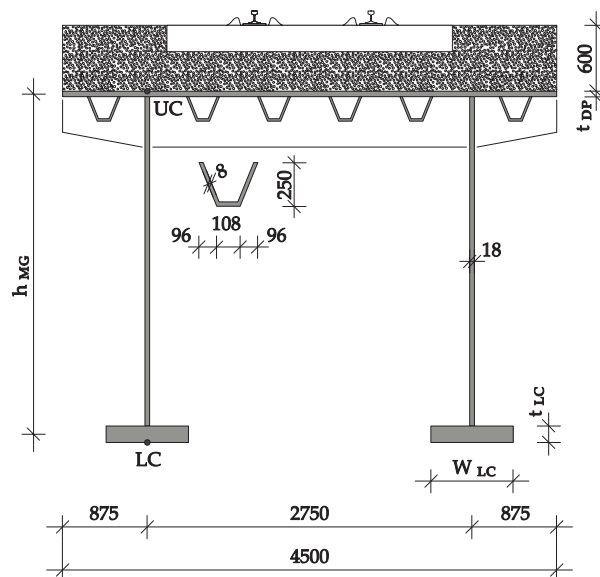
Single-span steel bridges — geometry overview — material S355
